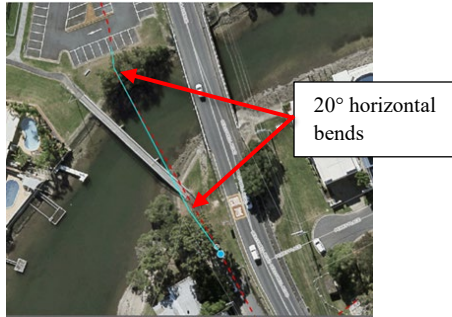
Plan of Biggera Creek crossing showing horizontal bends at each embankment
